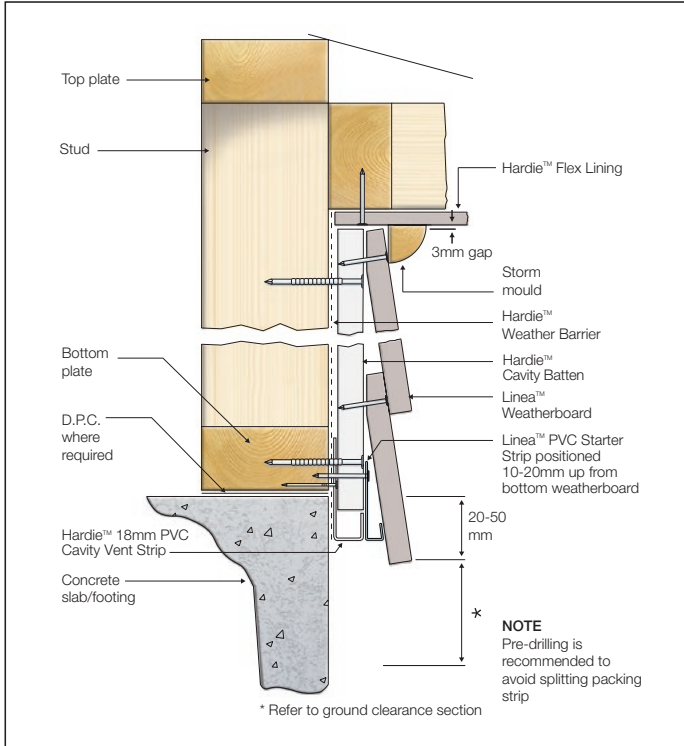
SLAB/EAVE JUNCTION DETAIL
